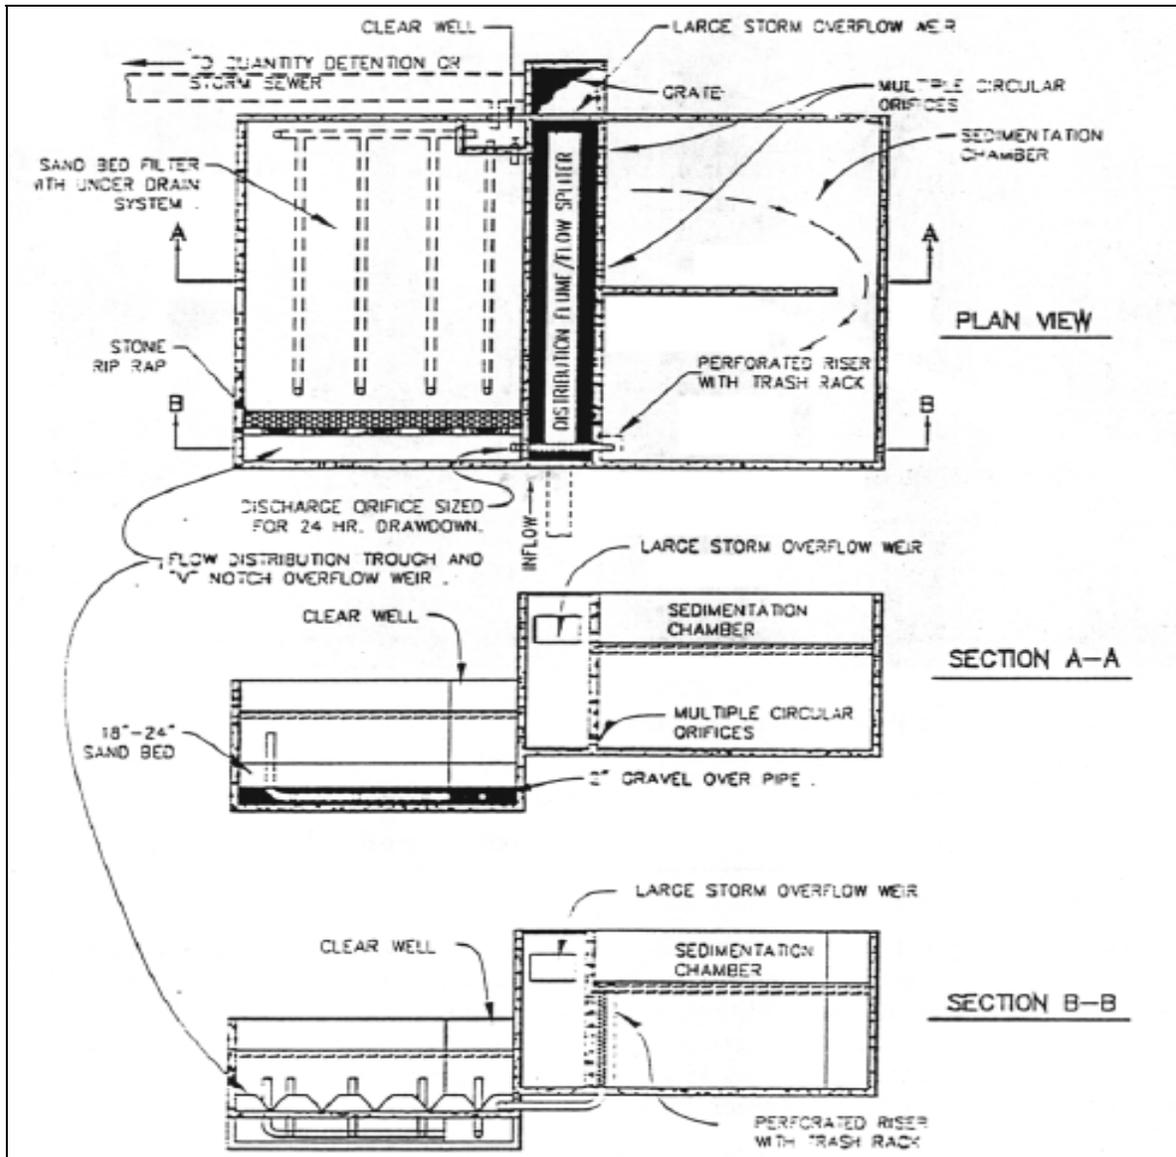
DCR/DEQ Washington D.C. Underground Vault Sand Filter
